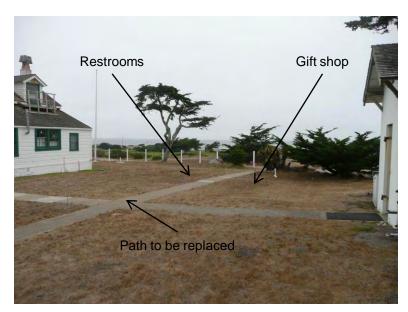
Location of proposed gift shop and restrooms (view northwest)
